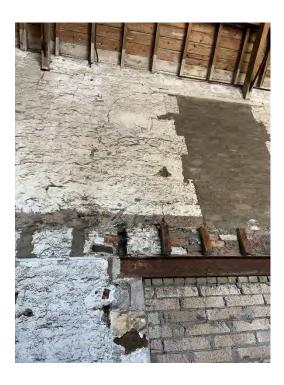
Internal North East Elevation –Intermediate Floor, Patches & Cracking
